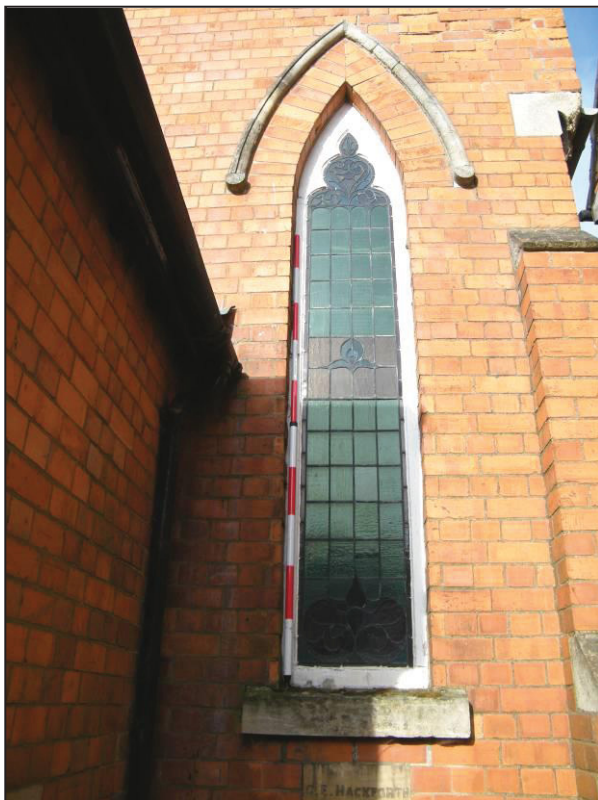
(Shot 3): Representative shot of lancet window on east elevation with stone hood mould and label stops, looking west
